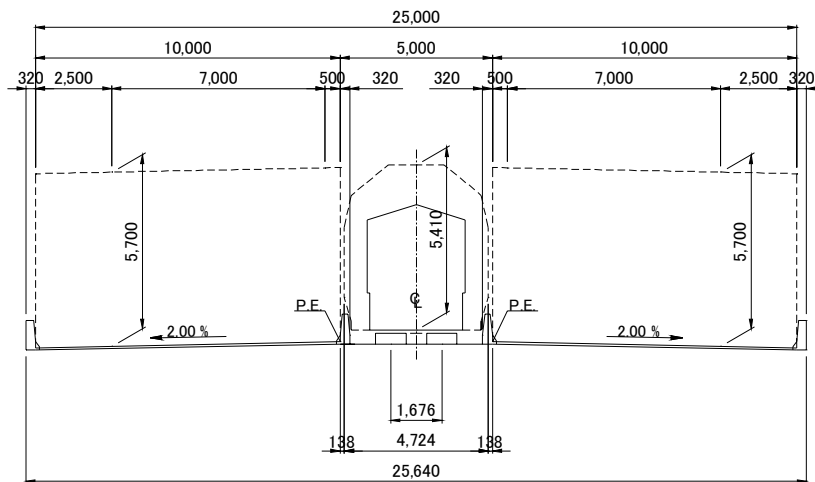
Typical Cross Section for Main Bridge after Railway Loading
